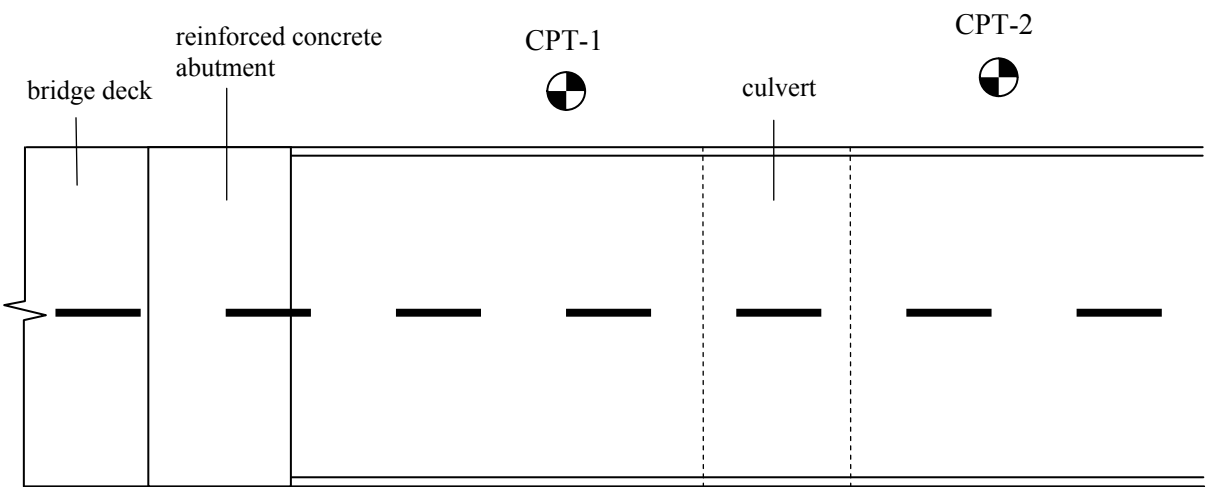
Plan view of the Arifiye Overpass and Cone Penetration Test locations
